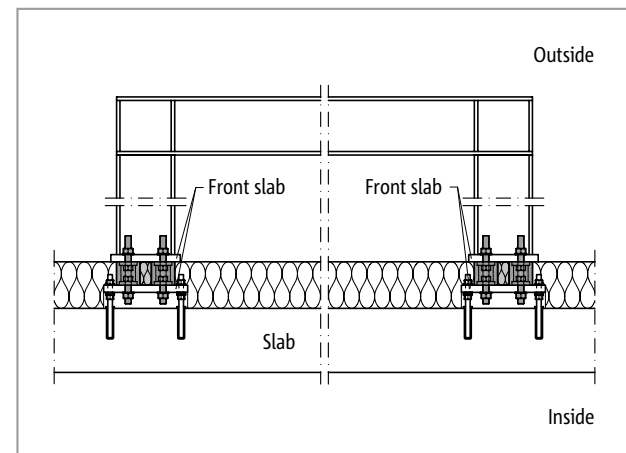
Schöck Isokorb® T type S-V for rigid frame connection for secondary structures (additional moments from imperfections are to be taken into account)
